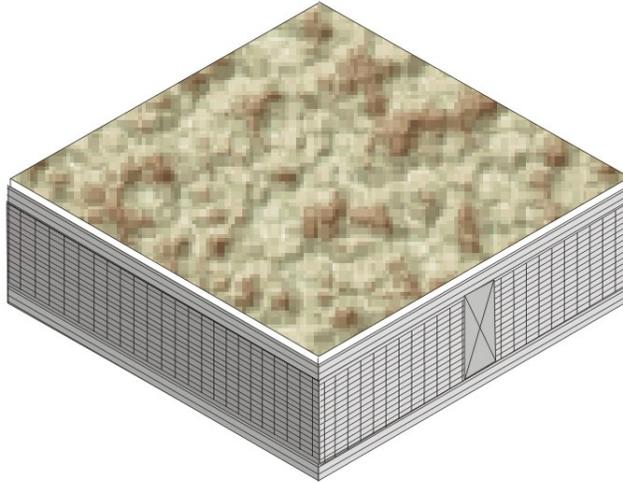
Wood Foam Panel (SIP) Floor
